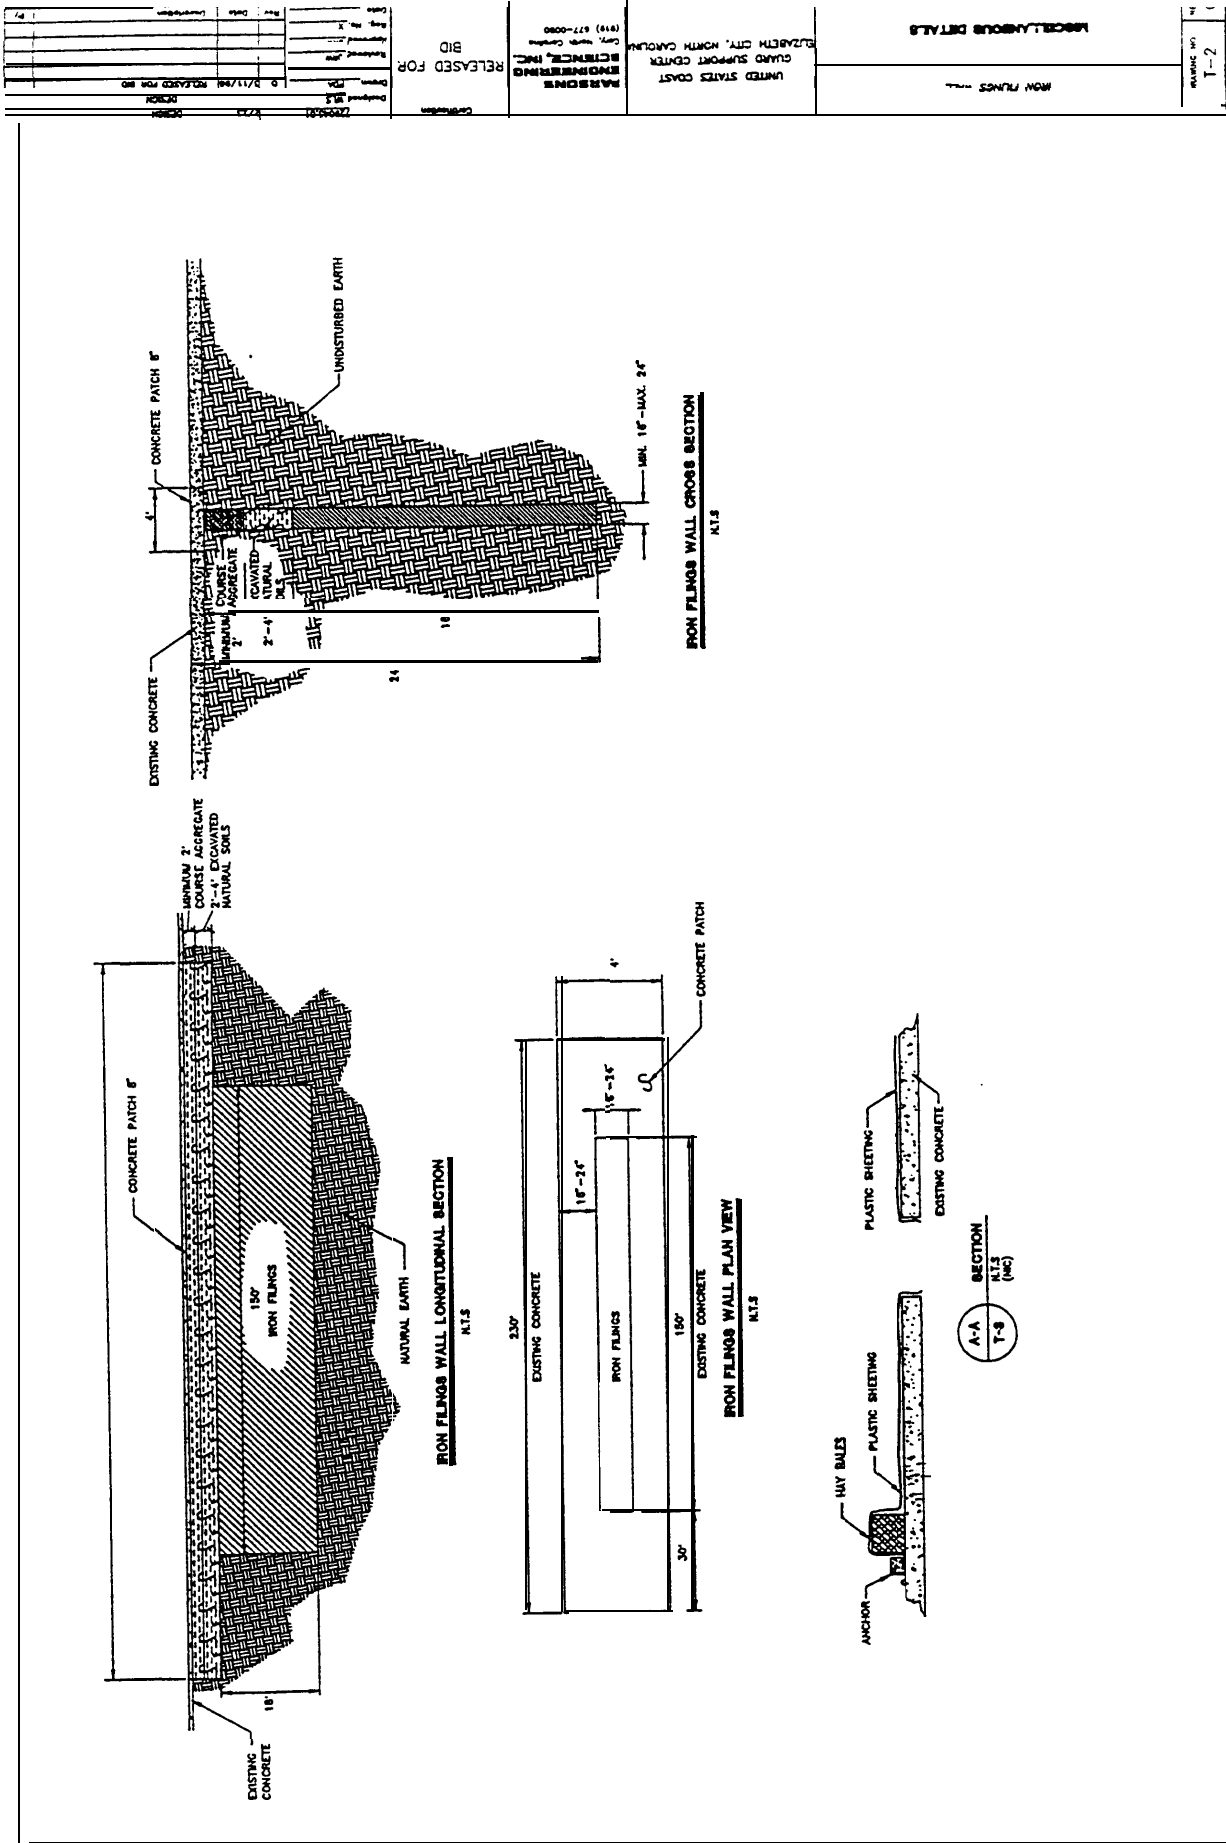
Design Plan for the Permeable Barrier Installed at the USCG Facility, Elizabeth City, NC (Schmithorst, 1997)
